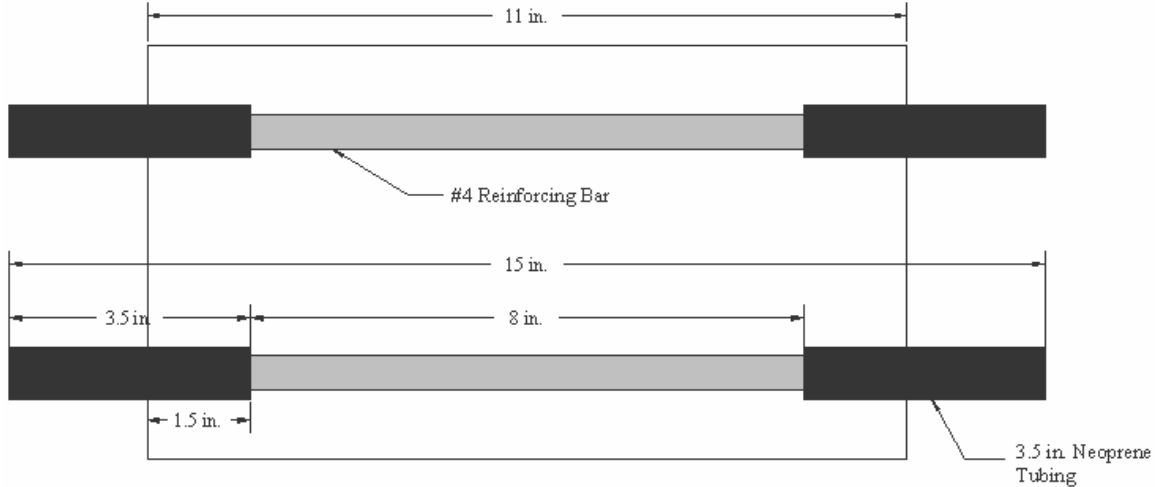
Location of Reinforcement for ASTM G 109 (section view)
